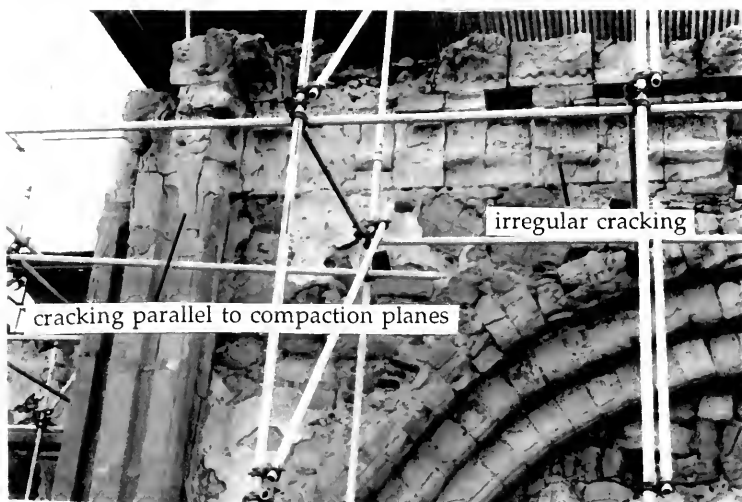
Cracking of volcanic tuff blocks in pilaster and cornice in east wall of nave.
